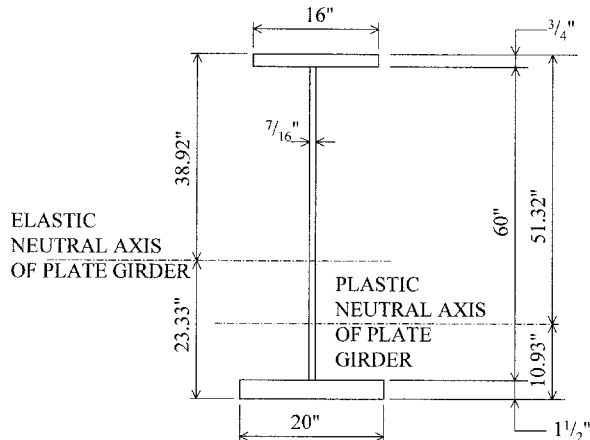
Cross section assumed for plate girder for LRFD example.
